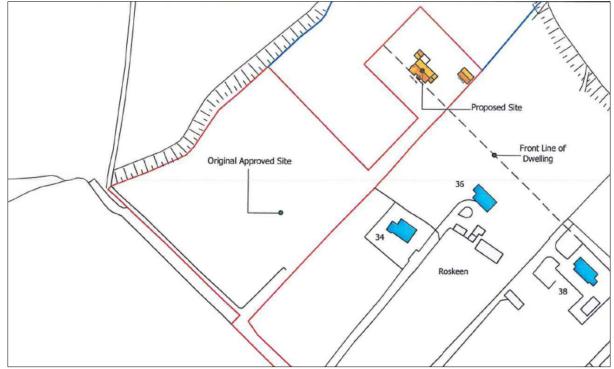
Current site location plan showing approx. location of previously approved dwelling and garage; and location of the change of house type including garage proposed.
